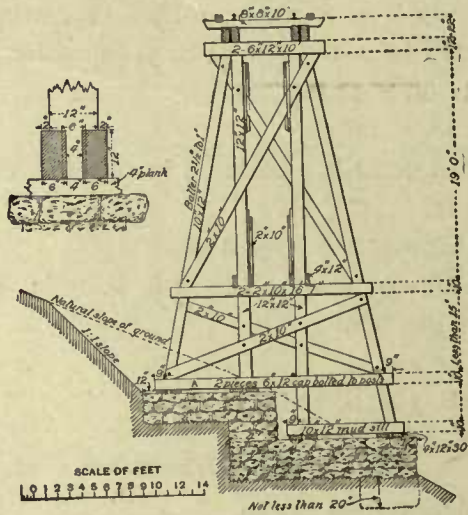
PLAN FOR BREAKING SILLS AND STEPPING FOOTINGS ON STEEP SLOPES.
